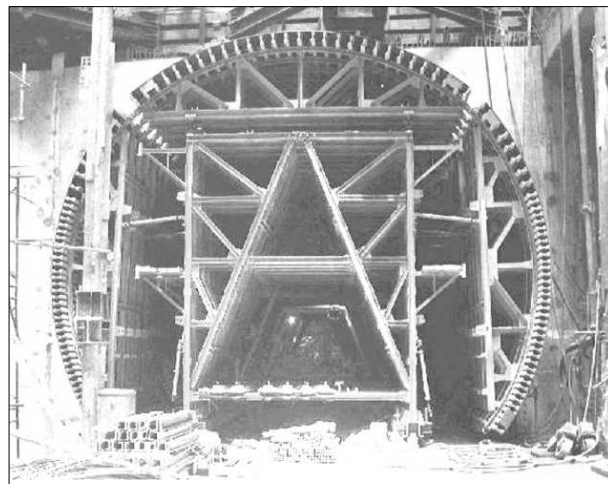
Formwork in Position for Construction of Tunnel (Courtesy L&T Formwork).
